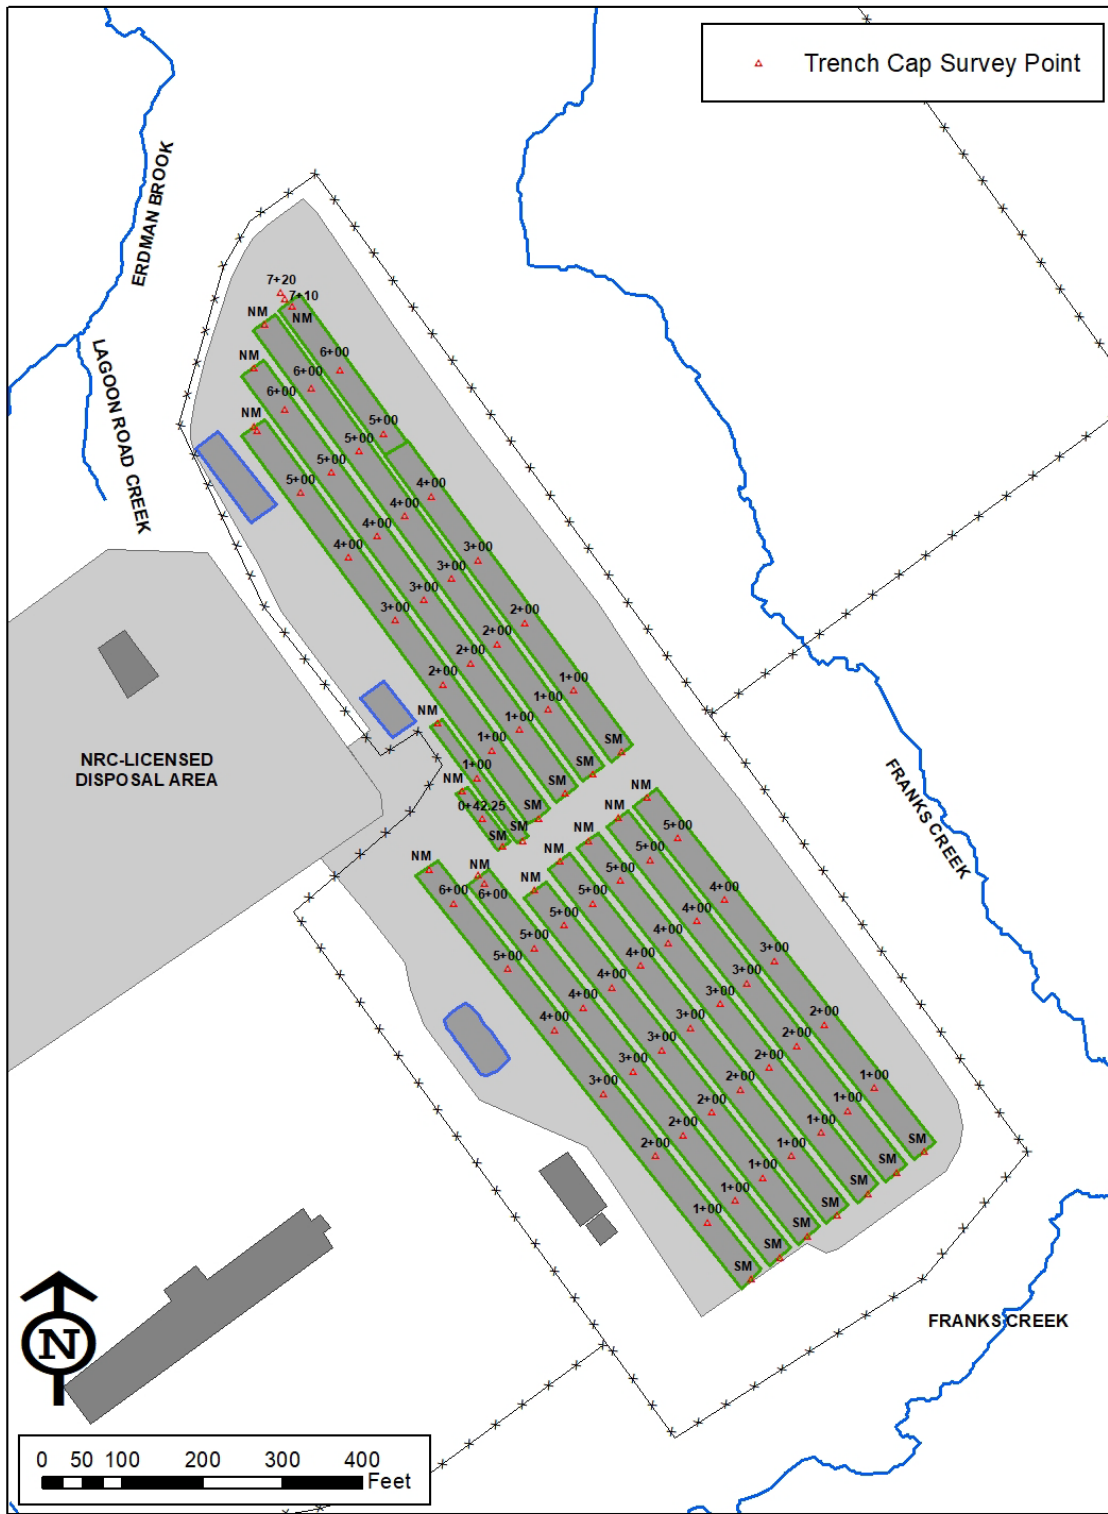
Trench Cap Ground Surface Elevations Survey Points
